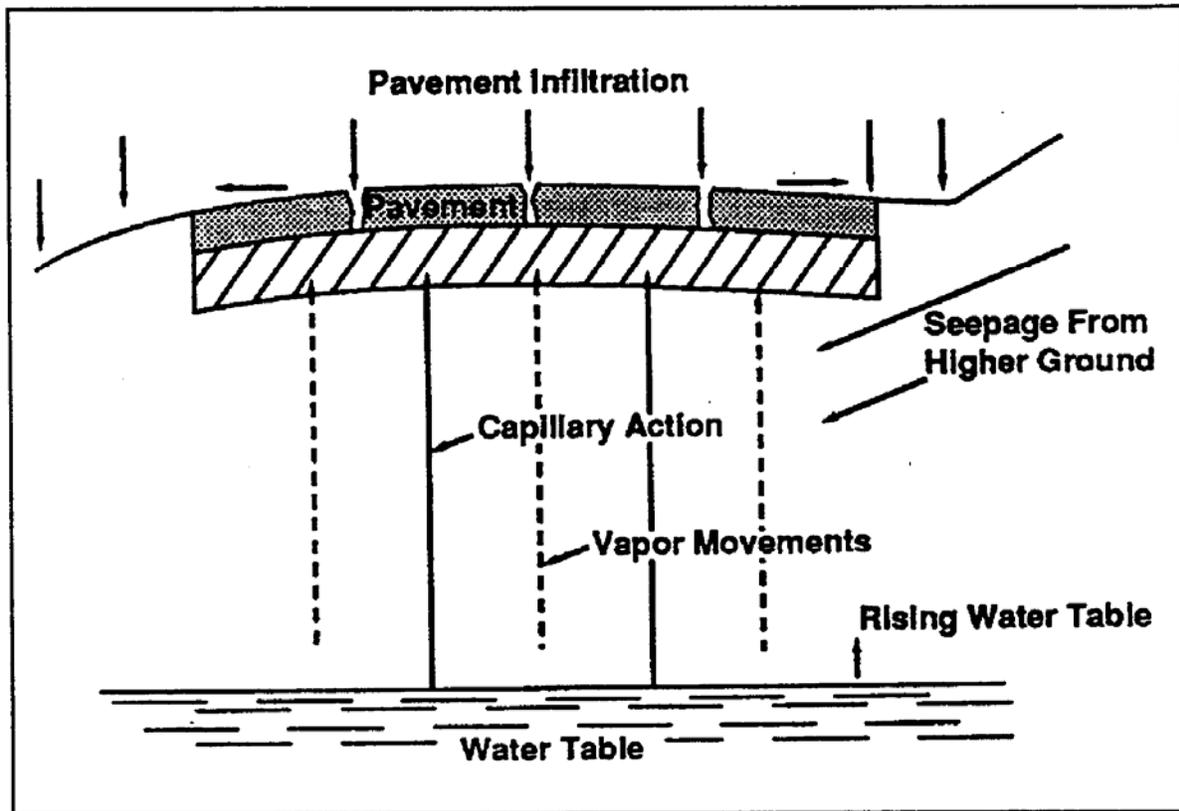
Sources of Subsurface Water in Pavements (FHWA, 1992)
